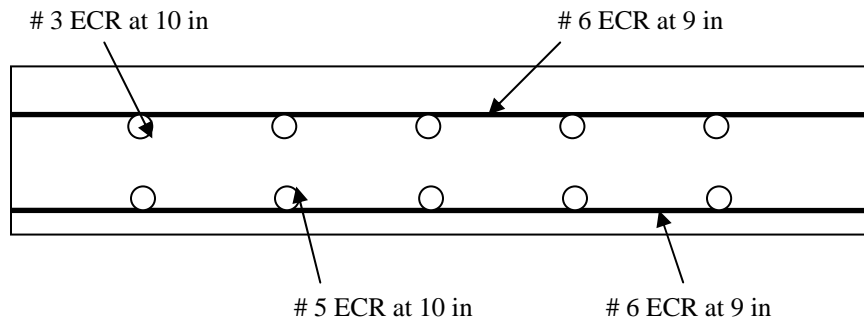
Standard MDOT Bridge Deck Slab (Not To Scale)
